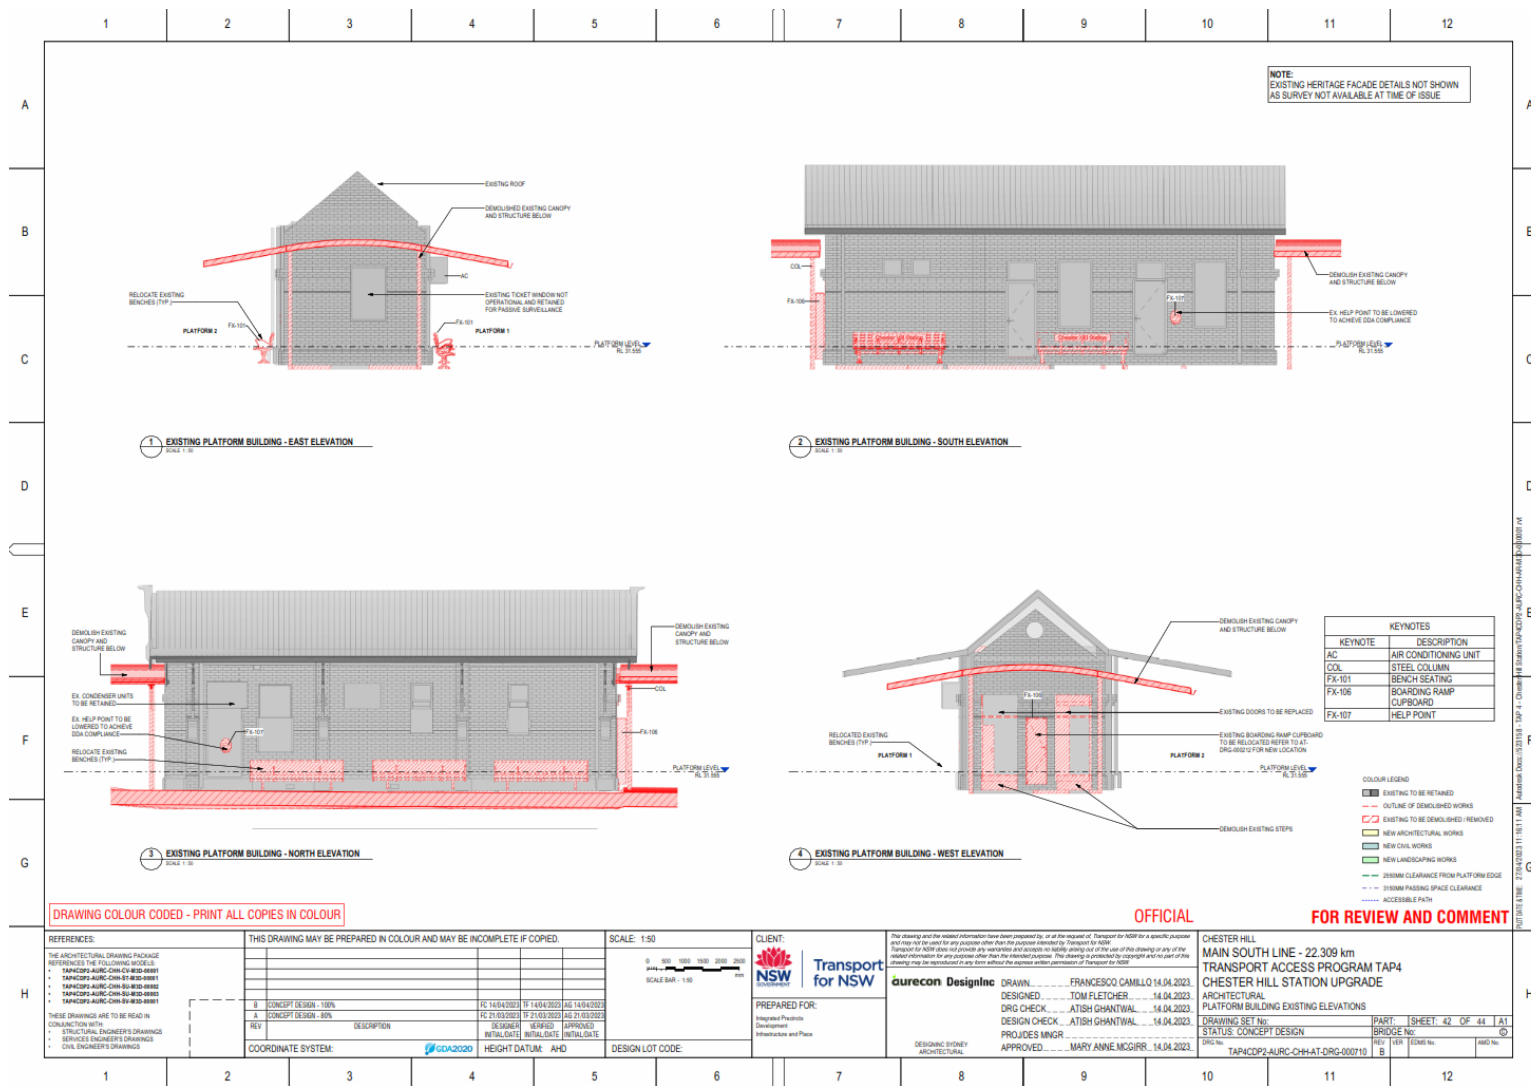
Platform building existing elevations Chester Hill Station (Source: Aurecon 2024)
